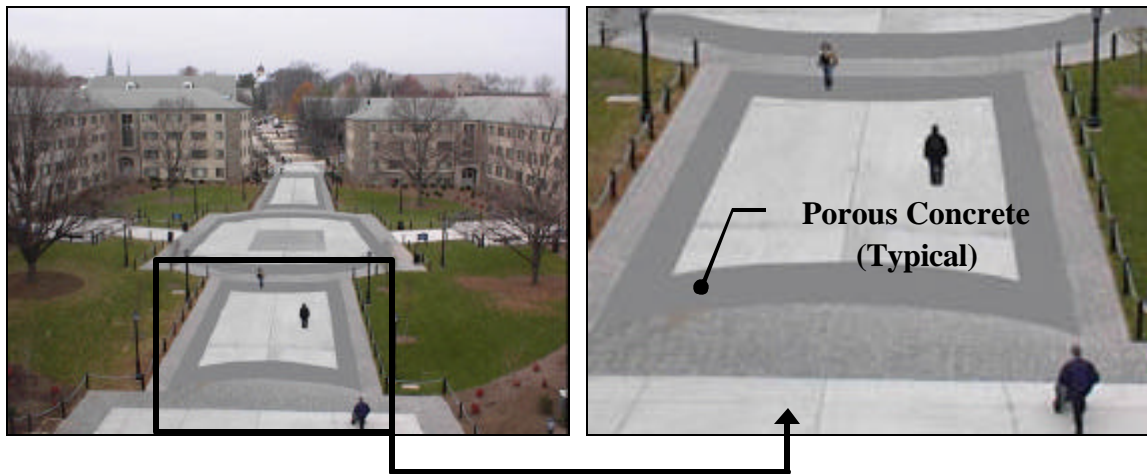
Porous concrete BMP highlighting the porous concrete (dark grey color)
